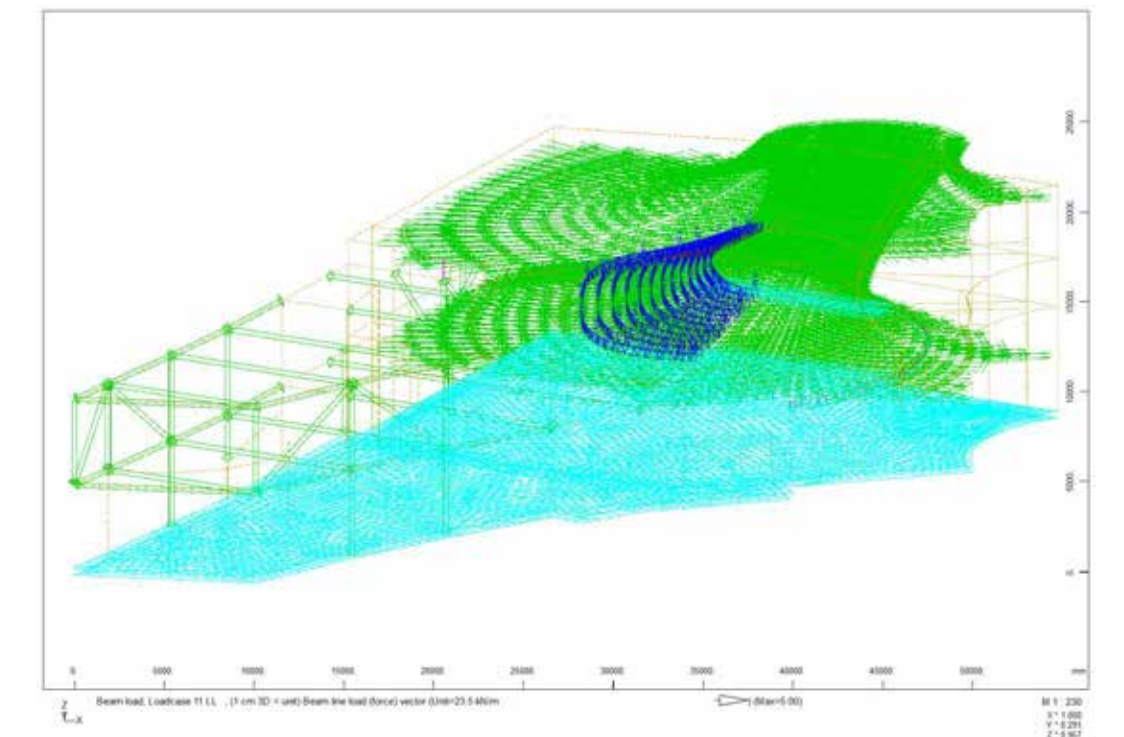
SDL loads on frame elements: fasade (5 kN/m), finishes on stepped auditorium (2 kN/m), finishes on stepped roof (1,6 kN/m)
